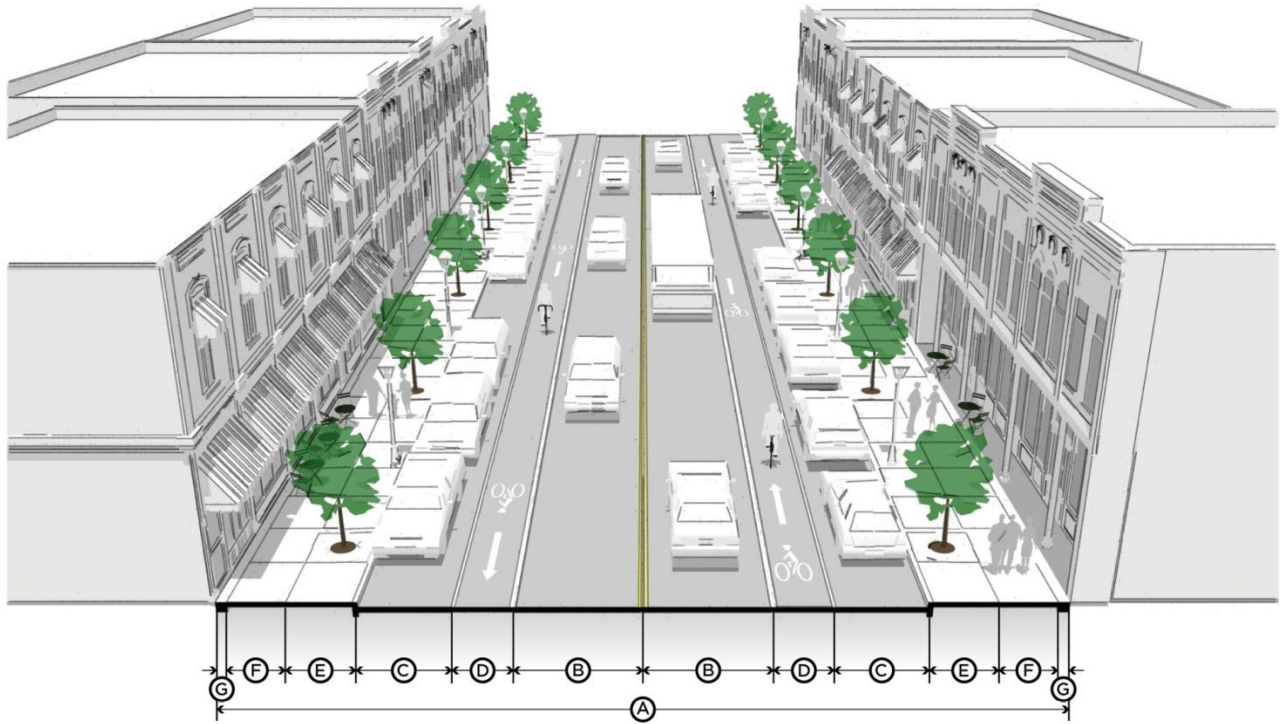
MINOR STREET: NEIGHBORHOOD TWO-LANE STREET
